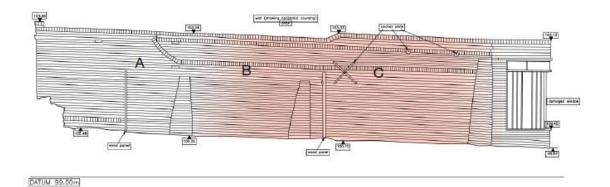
North end of the boundary wall as viewed from No. 22 Frognal Way. (Structurally unstable sections of the wall highlighted in red)
